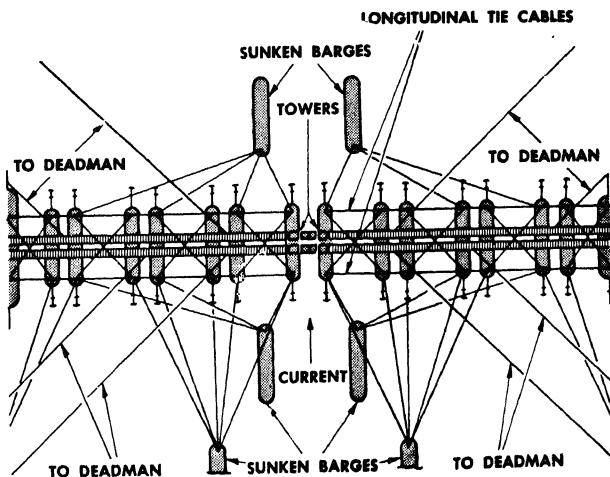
Suggested anchor and guy line systems. Modification for draw span.
